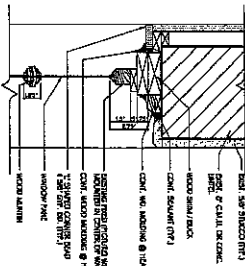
PIERRE G. L. DOOR HIRSHEN
